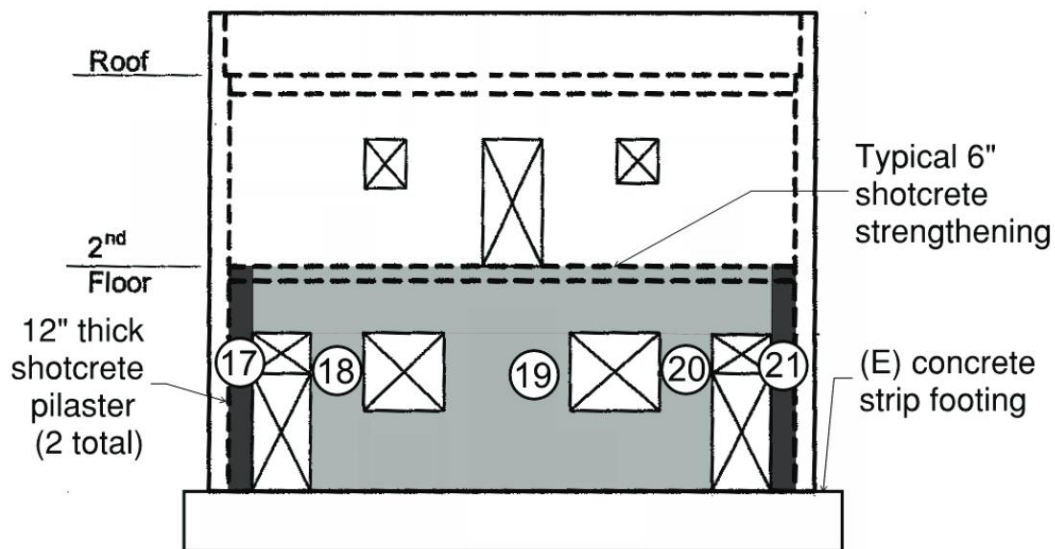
Figure showing Retrofit Situation 1 Elevation – rear wall.
